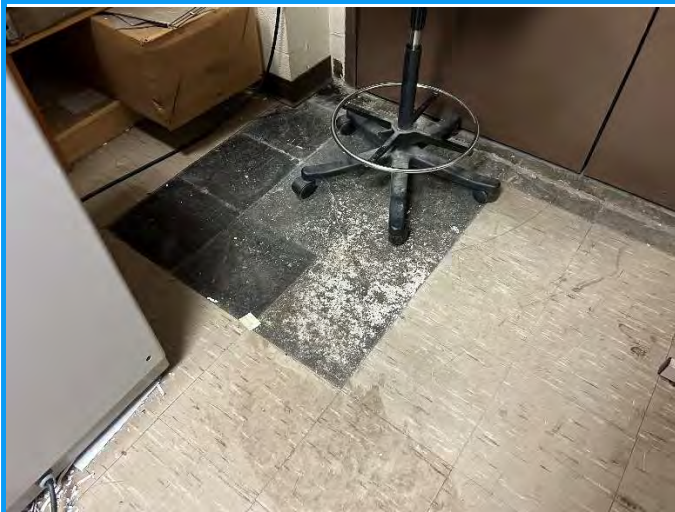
View of the flooring section of the 1st Floor central filing room previously with loose asbestos containing vinyl floor tiles observed to have been removed.
